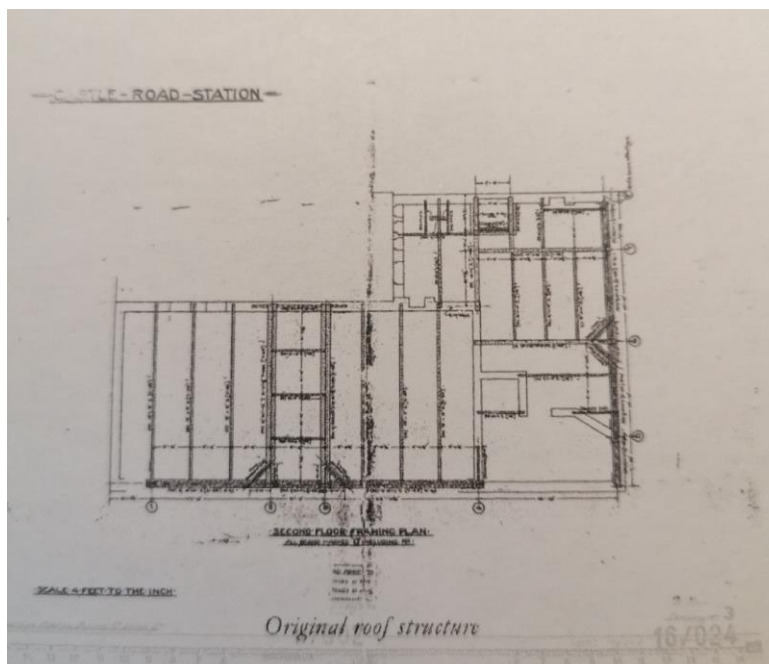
Roof structure drawing of South Kentish Town (then known as Castle Road) in 1906. [© original London Transport Museum 1998/90350 reproduced in Pre-Application Planning, Design and Access Statement (Feb 2018) Cooley Architects]
